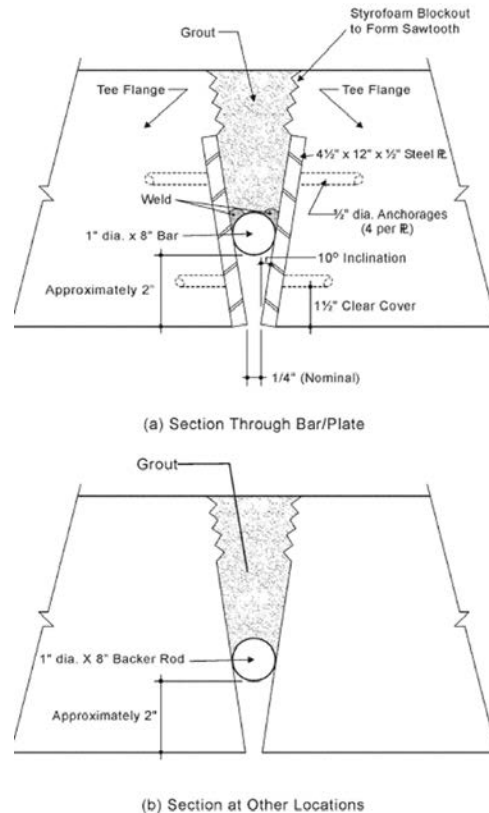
Proposed Simple Detail for TxDOT Girders (Jones, 1998)
